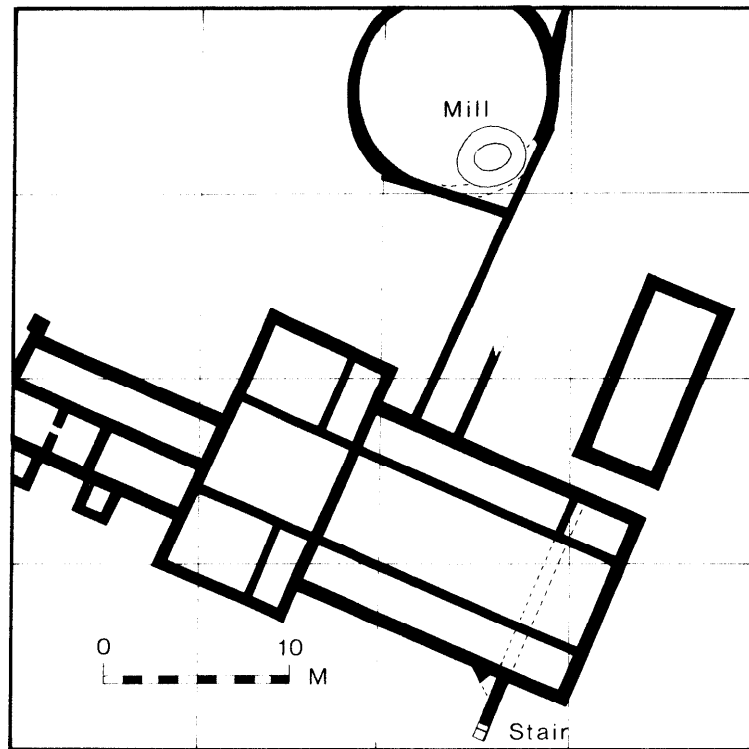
Stanwick villa, Northants. Groundplan of aisled hall and mill in the 3rd century (D S Neal)
